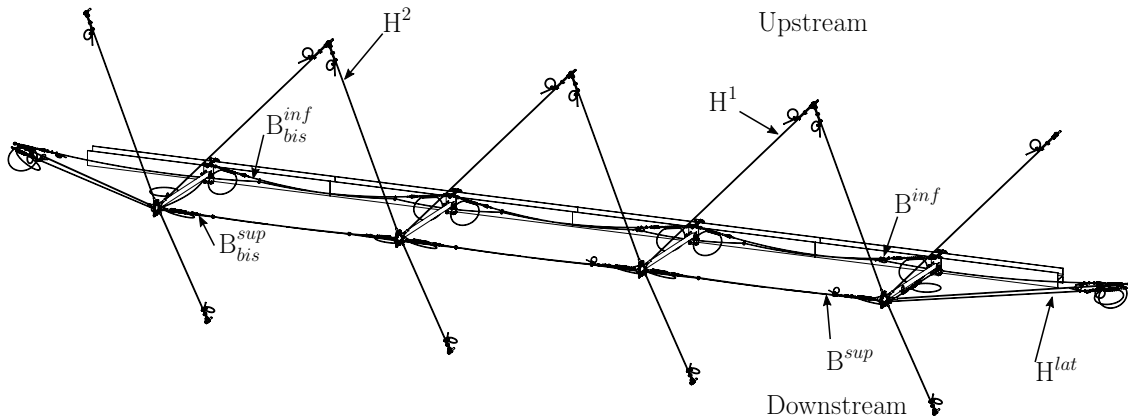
Technical drawing of the tested barrier (Courtesy of PN C2ROP).
